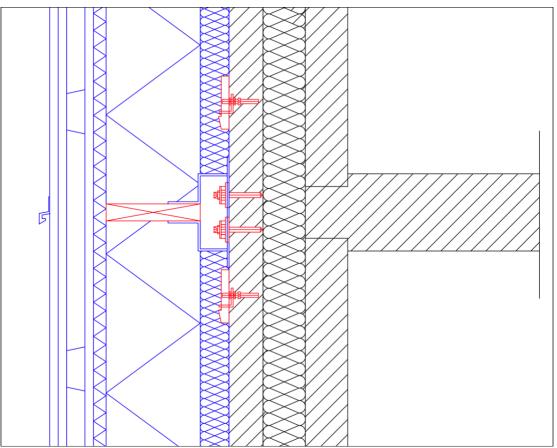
Detail drawing of attachment at the floor slab where the prefabricated facade is attached onto the existing building facade.
